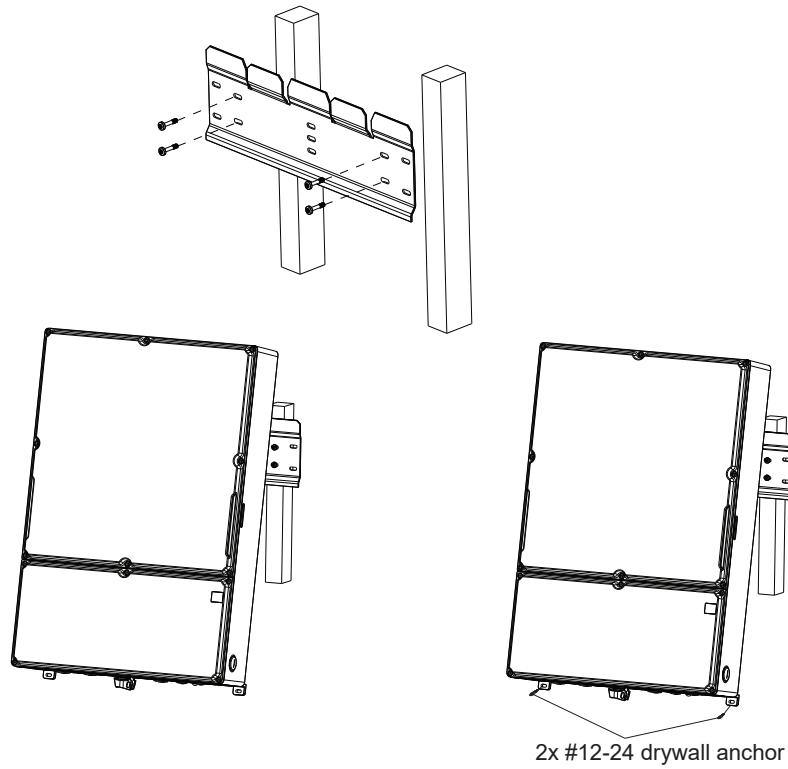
Installing the plate and GM Energy Inverter on a wood stud wall
